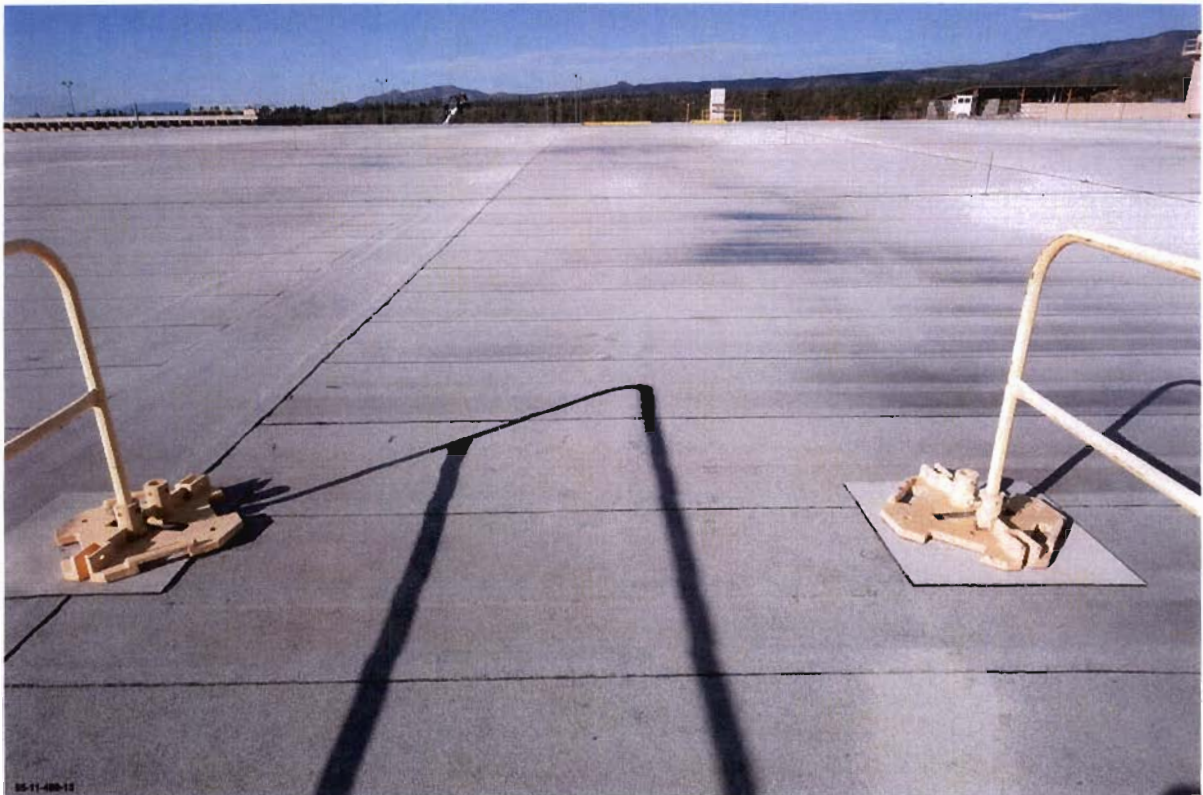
Location for Drag Strut (Looking South Across PF-4 Roof)
